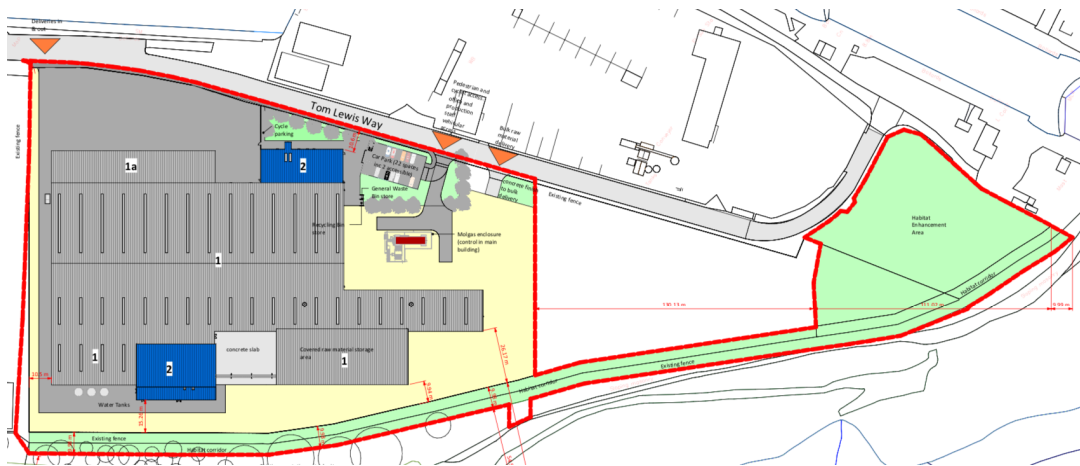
Extract from Site Plan showing habitat enhancement to the south and habitat corridor
